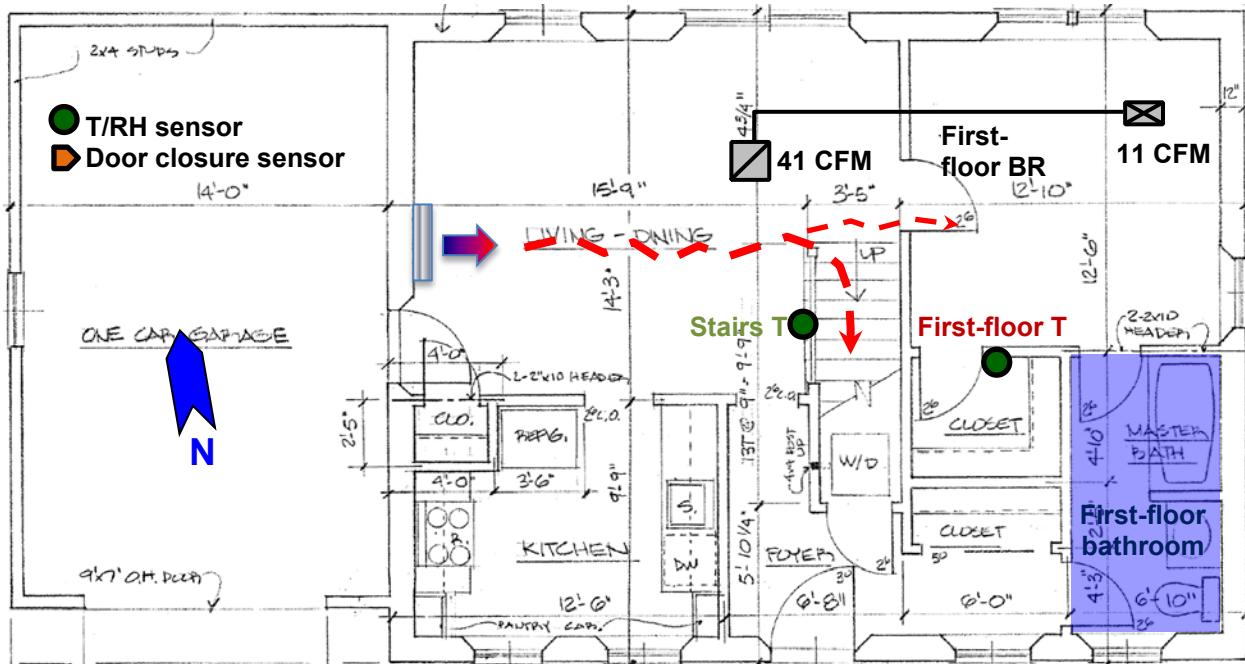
Easthampton Lot 17 first-floor plan, mini split locations, monitoring locations
